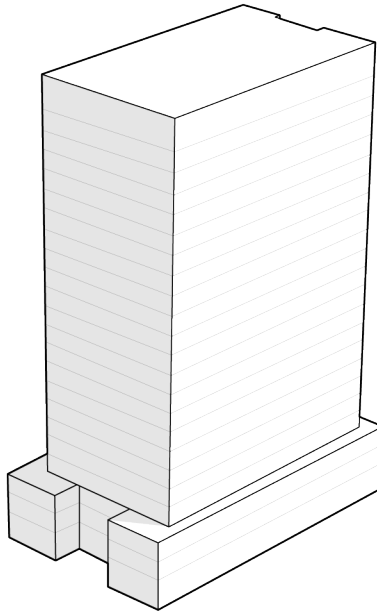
Maximum Building Envelope (Isometric view)
